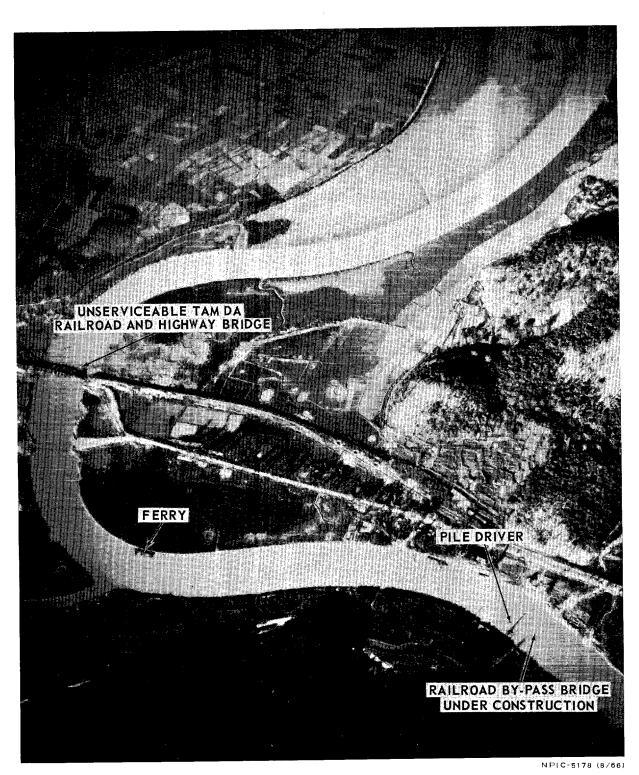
RAILROAD BY-PASS BRIDGE UNDER CONSTRUCTION, THANH HOA/VINH RAIL LINE, NORTH VIETNAM
